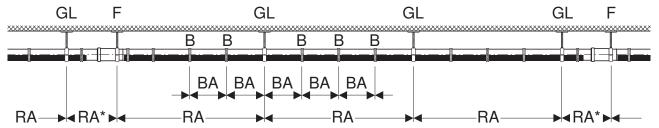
Pipe bracket spacing RA when fastening to ceilings and walls, with support shells
